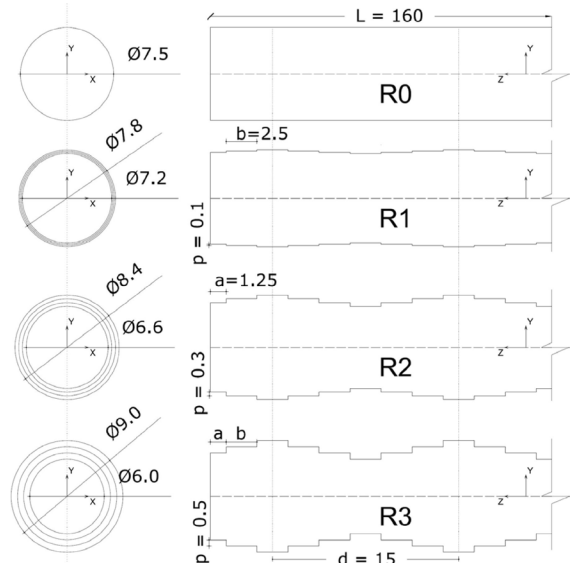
Illustration of Metamaterial reinforcement bars: cross section XY and YZ section.
